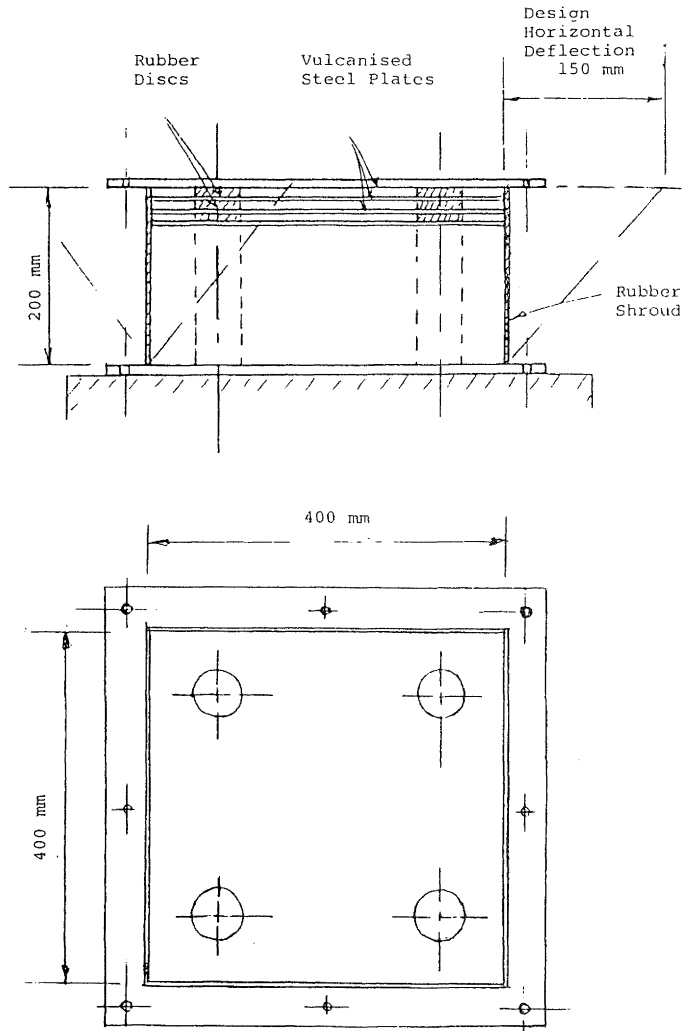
DETAILS OF PROTOTYPE HSAB BEARING
